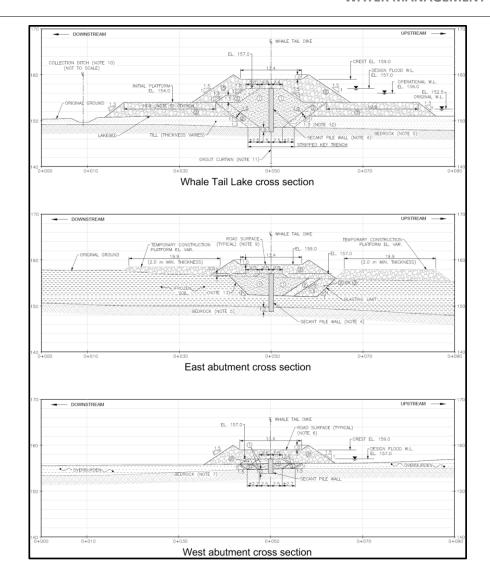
Typical Sections of Whale Tail Dike and Whale Tail Dike Abutment
